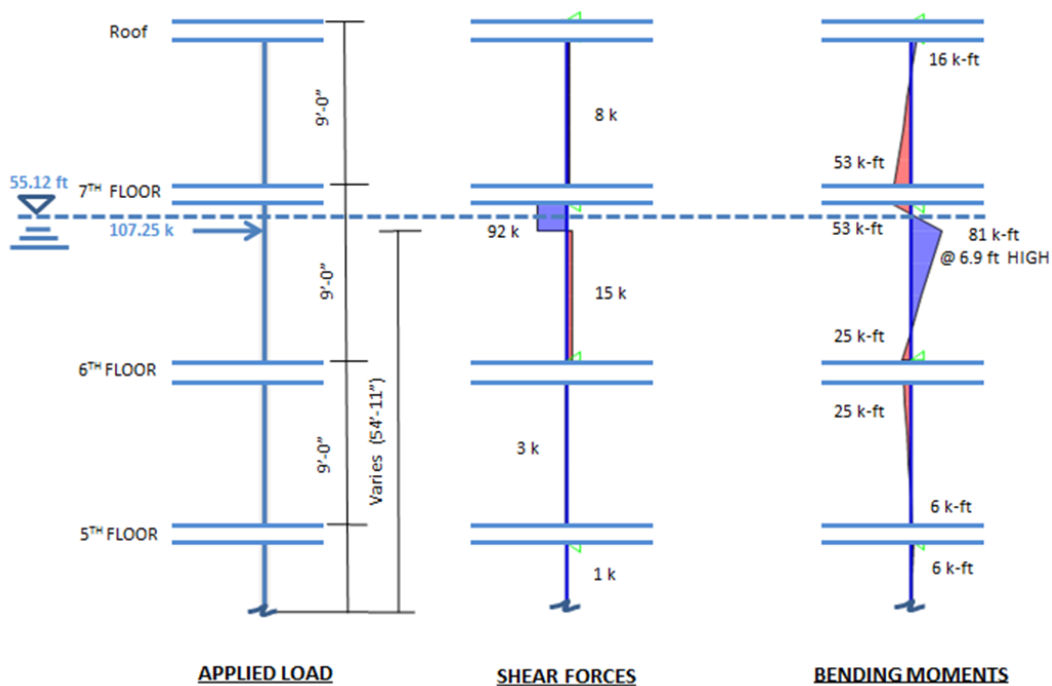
Impact load applied at "d" away from the end of column on the 6th floor
